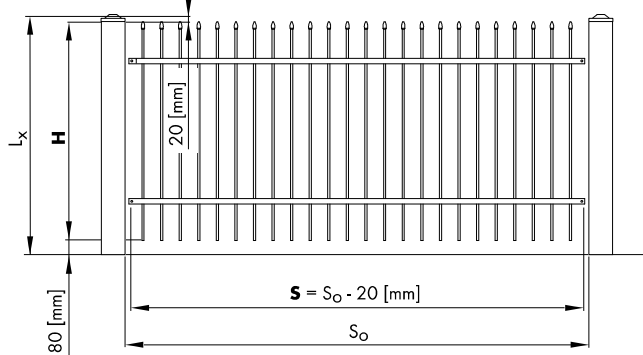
The assembly dimensions and their marking required for correct selection and assembly of the segment - view from the premises side.
